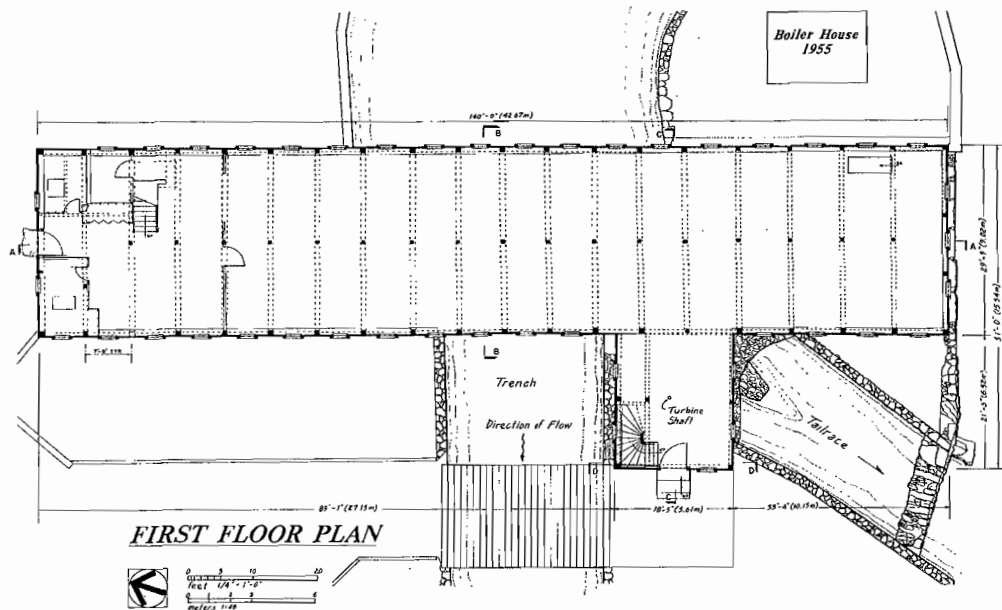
Slater Mill, Floor Plan. Drawn by Lee Ann Jackson and Todd Croteau in 1992, HABS, RI-1-1522, "Slater Mill, c1835, First Floor Plan," page 4 of 24
